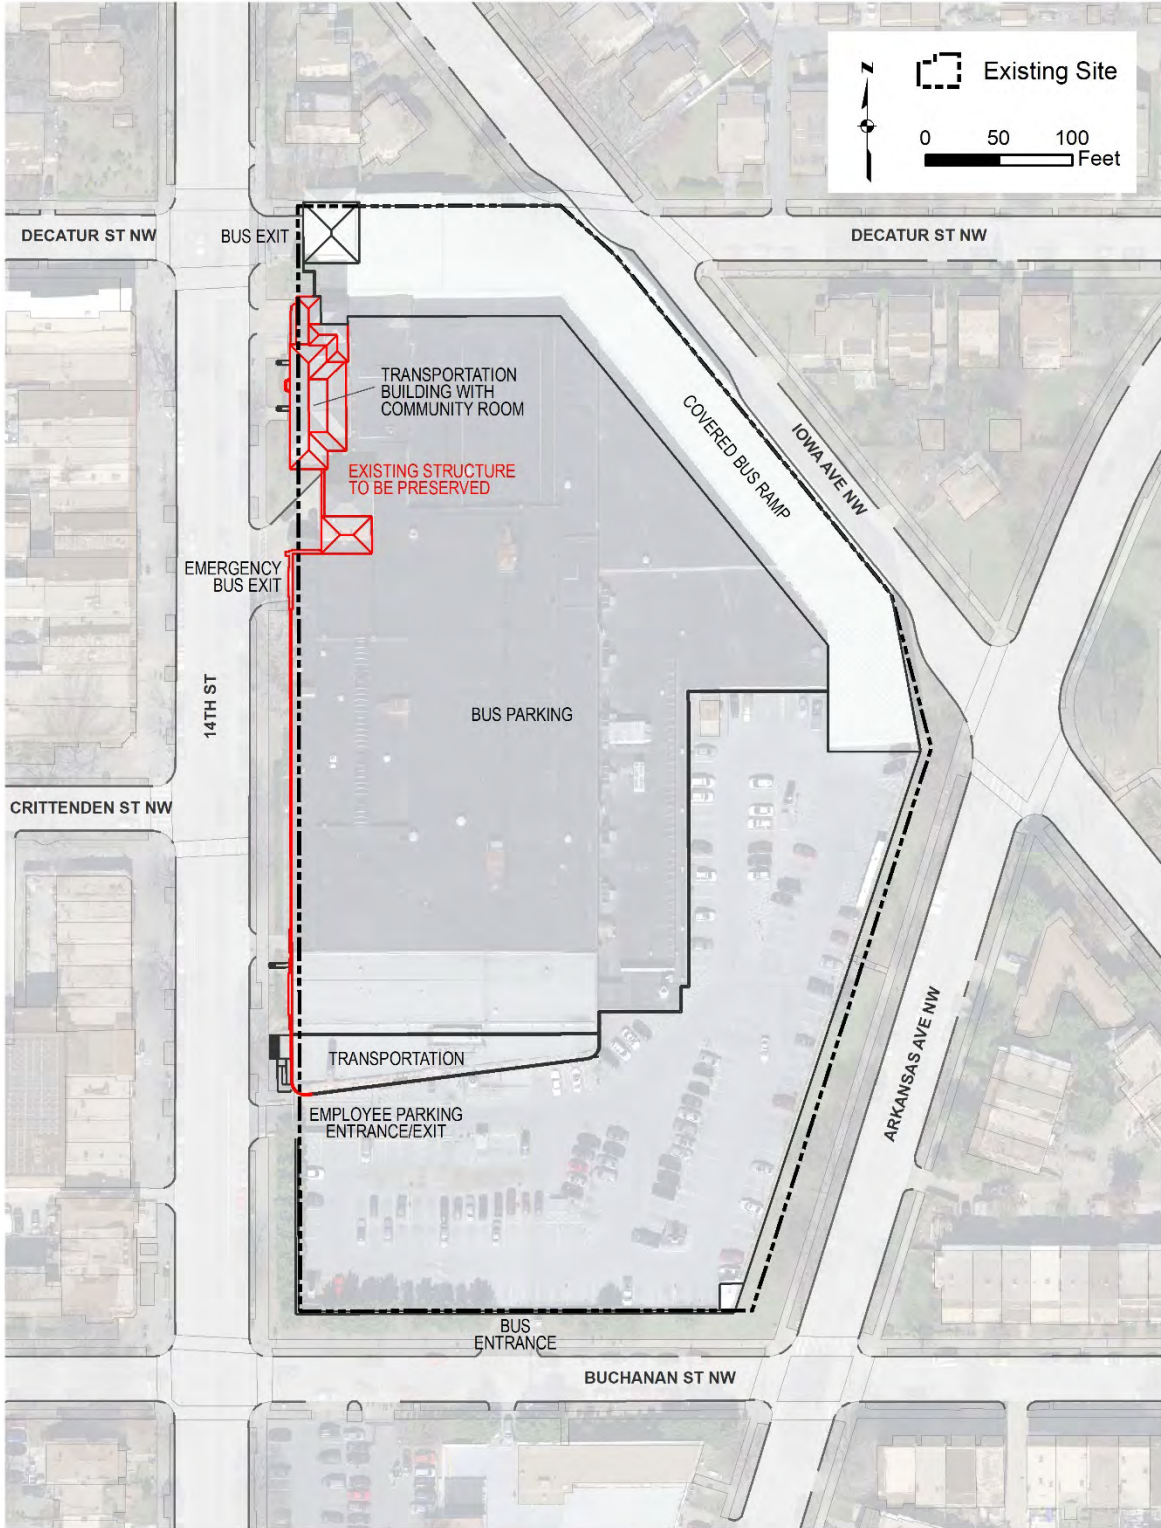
Previous Detailed Project Concept (Proposed Conditions)
